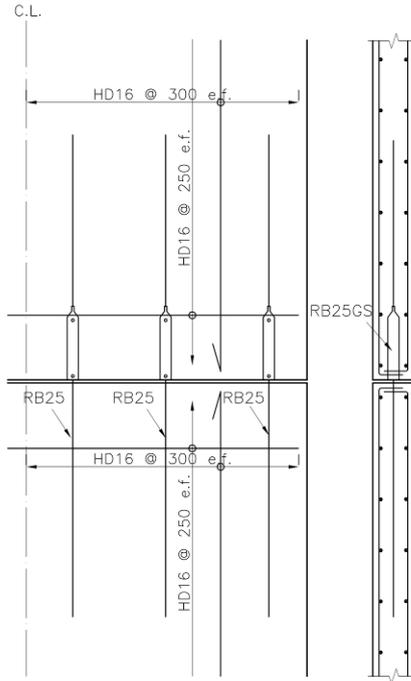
An example of a grouted sleeve horizontal connection between precast panels.
